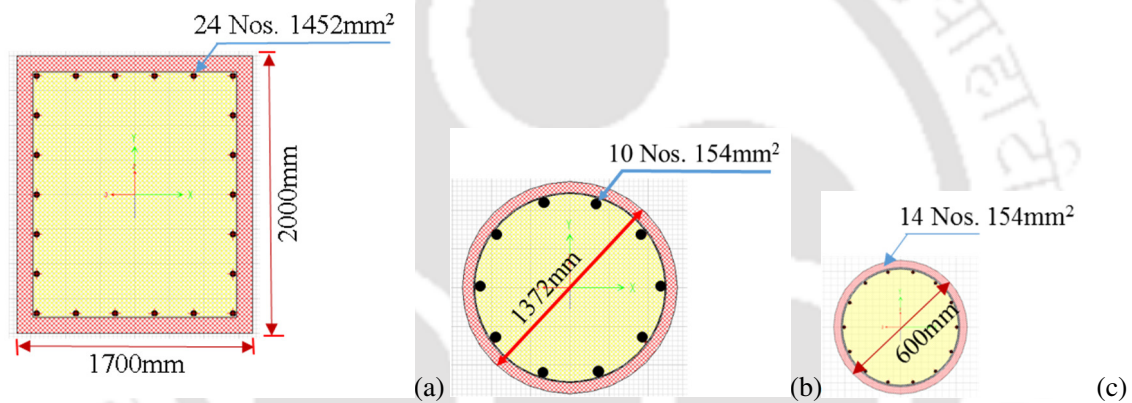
Reinforcement detailing of cross-sections for (a) pier, (b) pier piles and (c) abutment piles.
